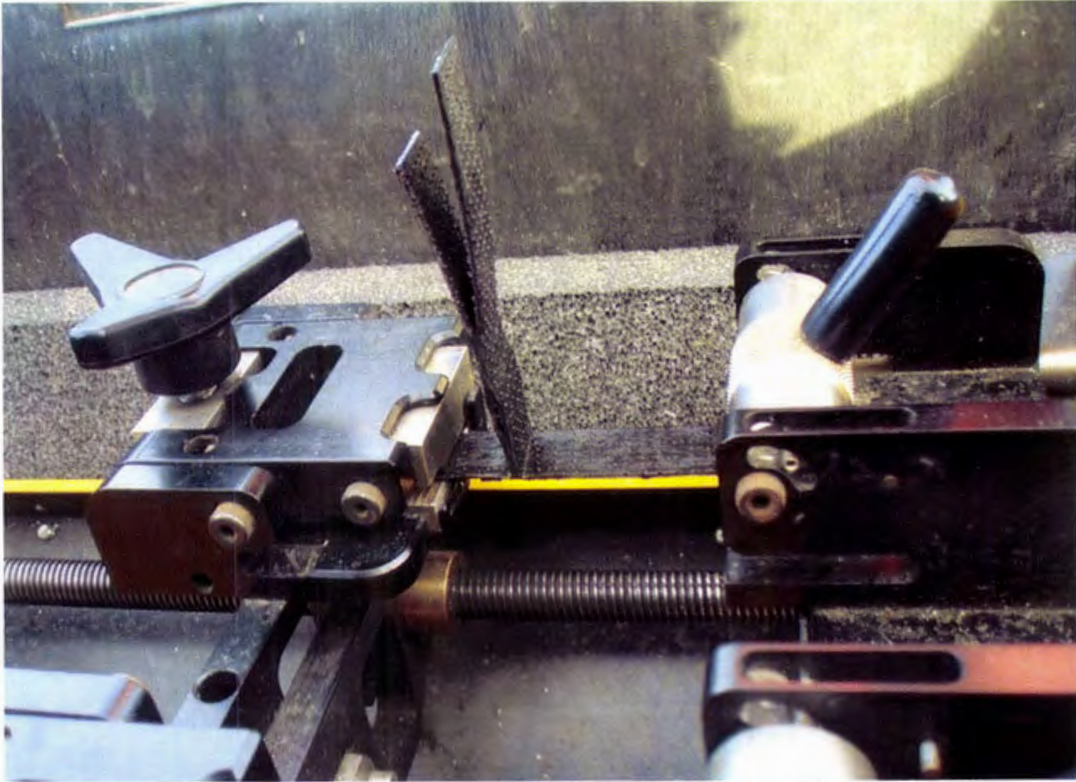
Textured-to-textured double-fusion trial weld field tested for peel strength
